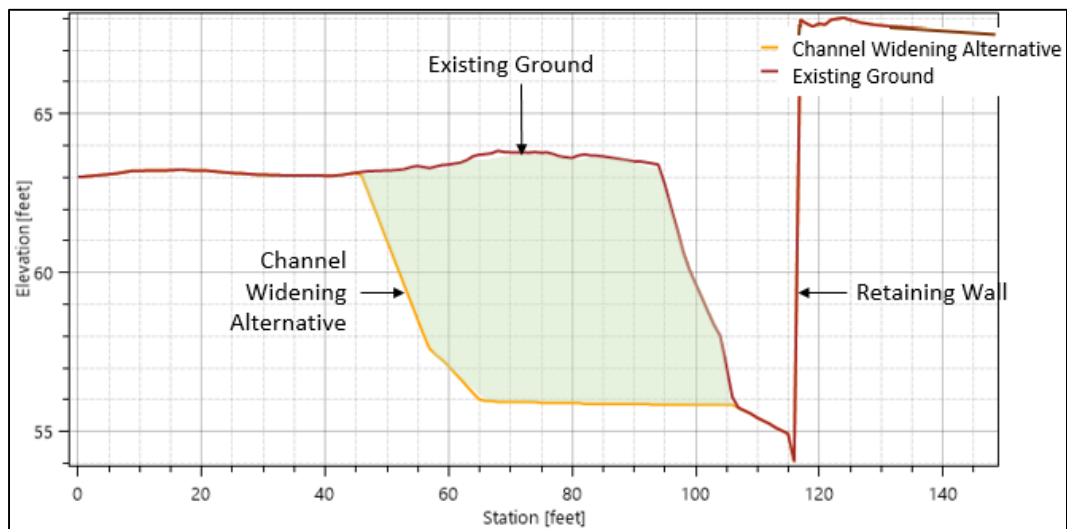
Cross section of Bank Widening Alternative. See Figure 20 for cross section location.
